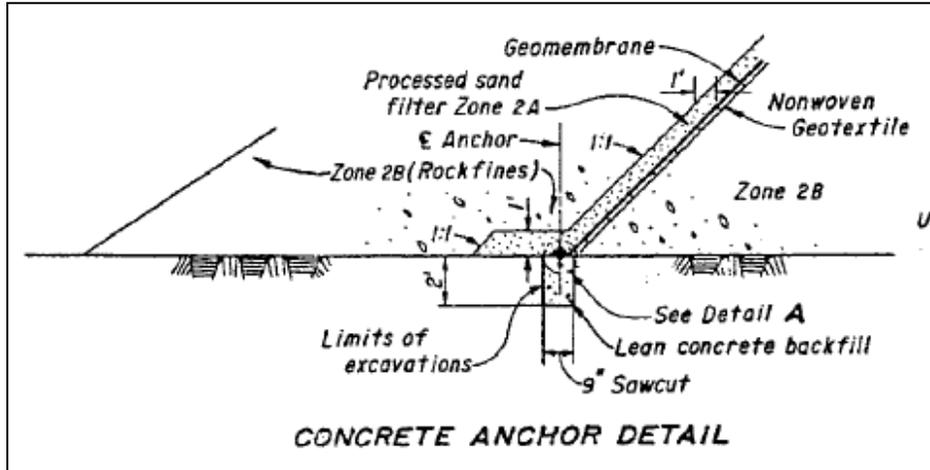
Pactola Dam geomembrane key trench tying into bedrock.
